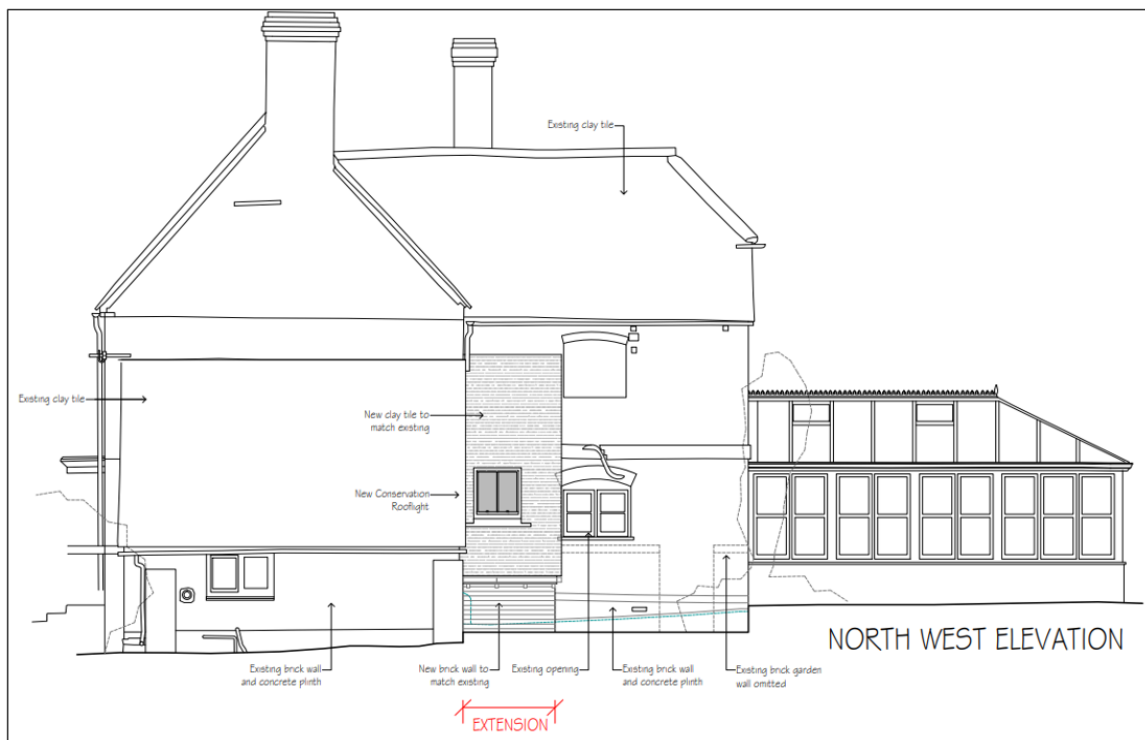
Proposed north-west elevation of Church Farm House, with the proposed extension (Fowler Architecture and Planning).
